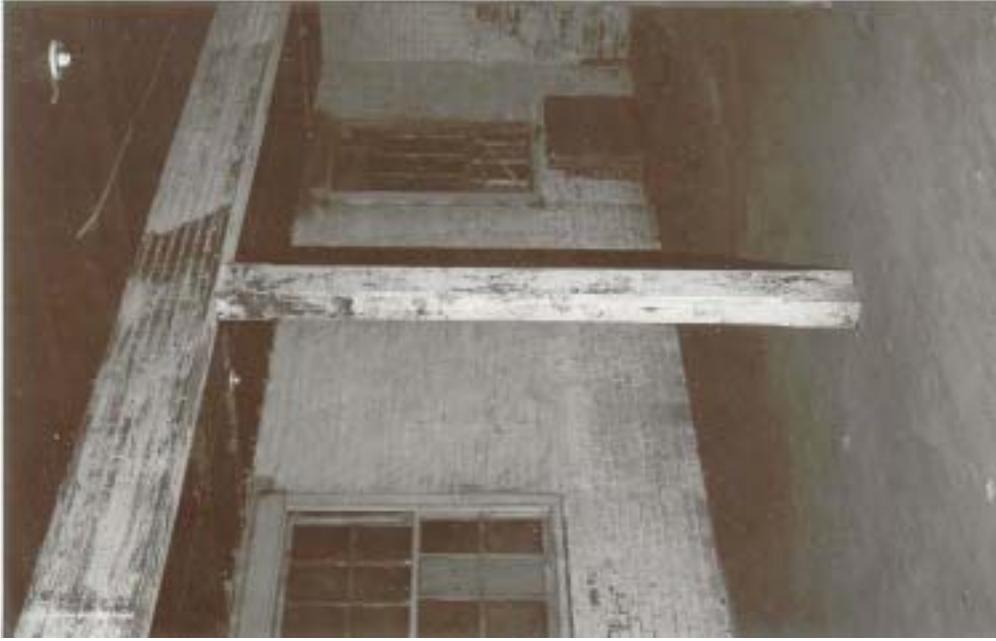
Room 210, looking northwest at attic-floor framing (cased post and beam) [1993].
